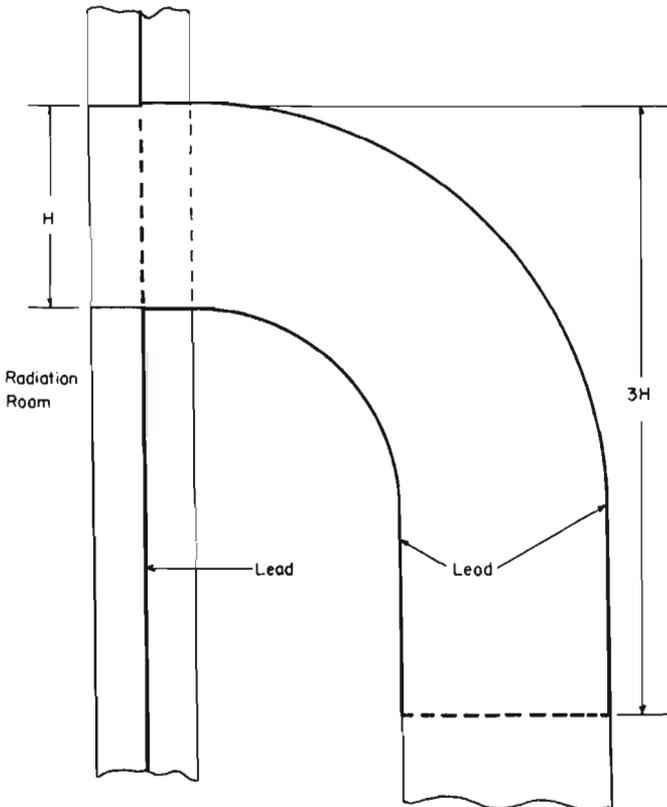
Typical baffle design for openings in secondary protective barrier.
